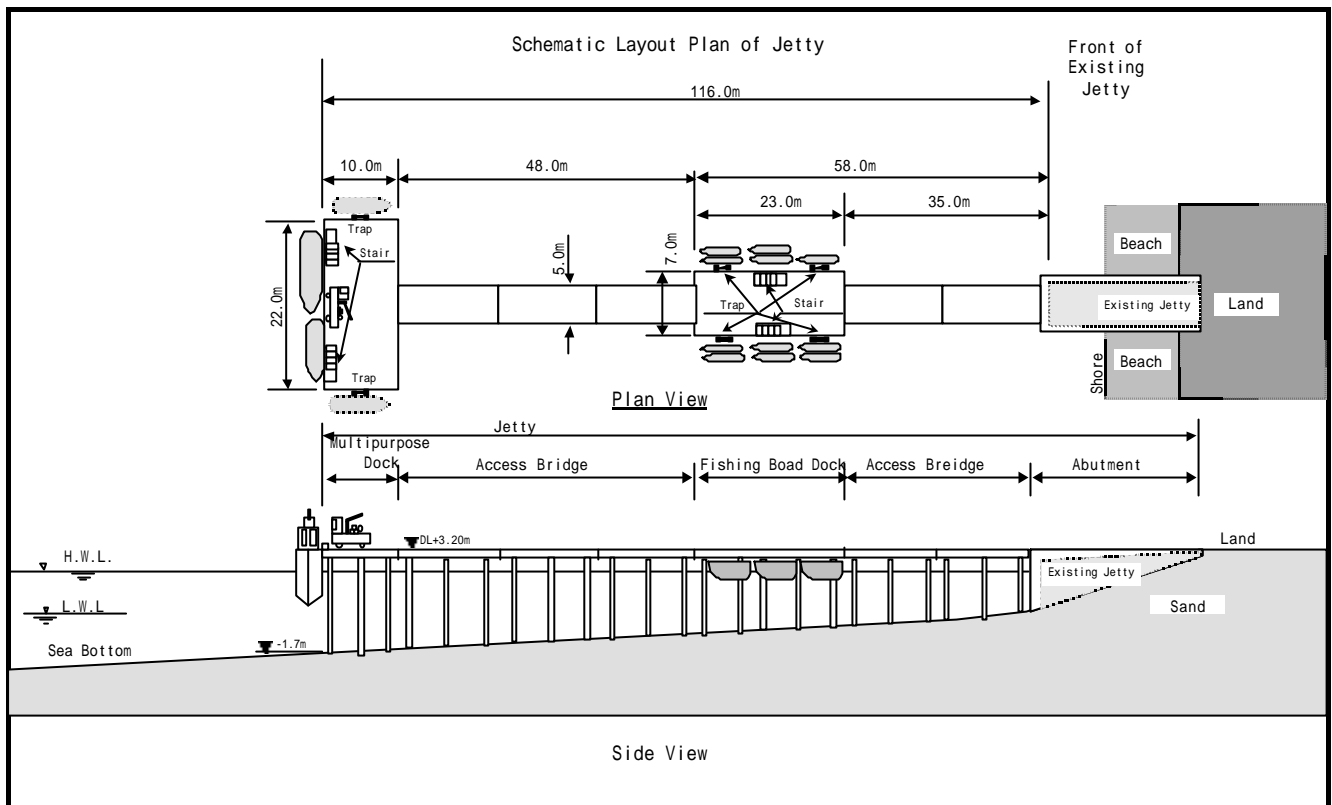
Schematic Layout Plan of Jetty
